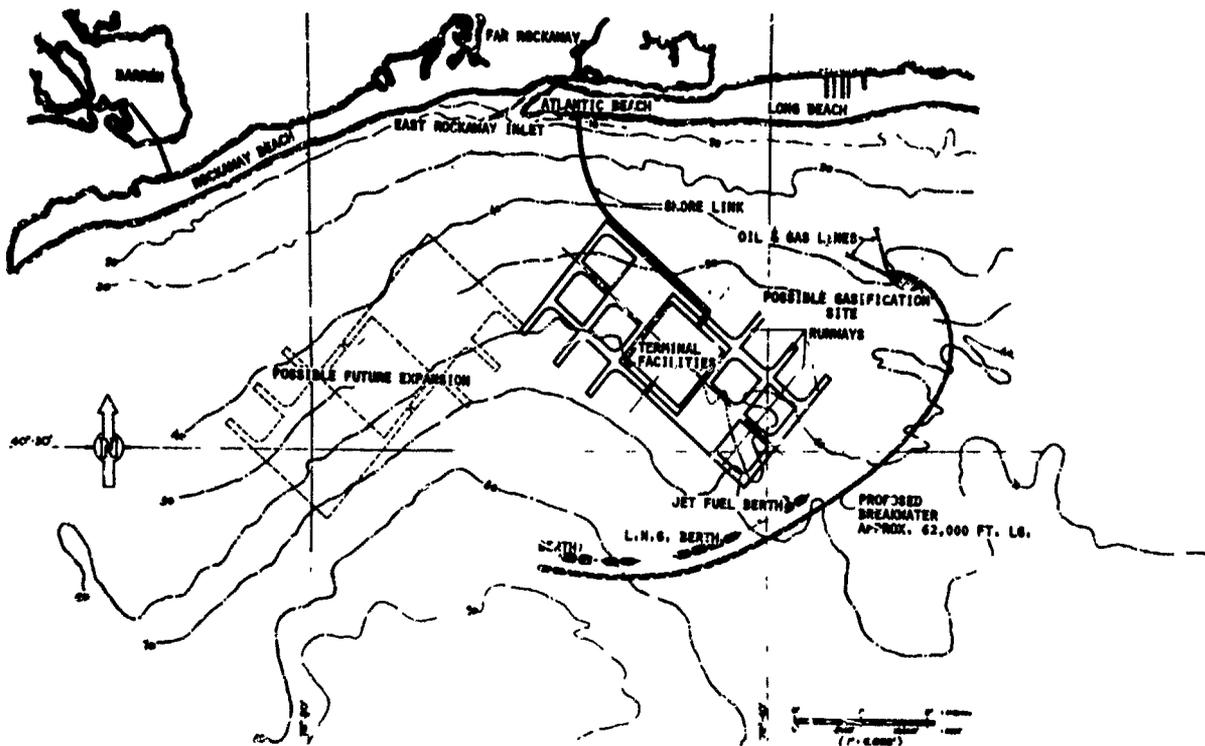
General Site Plan of Proposed New York Offshore Airport.
